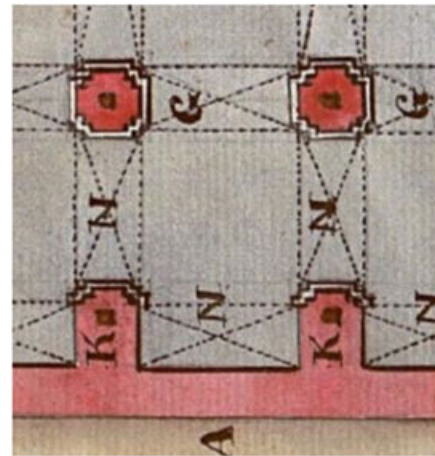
A detail of the pillars with the dark rectangular shape inside the structures
